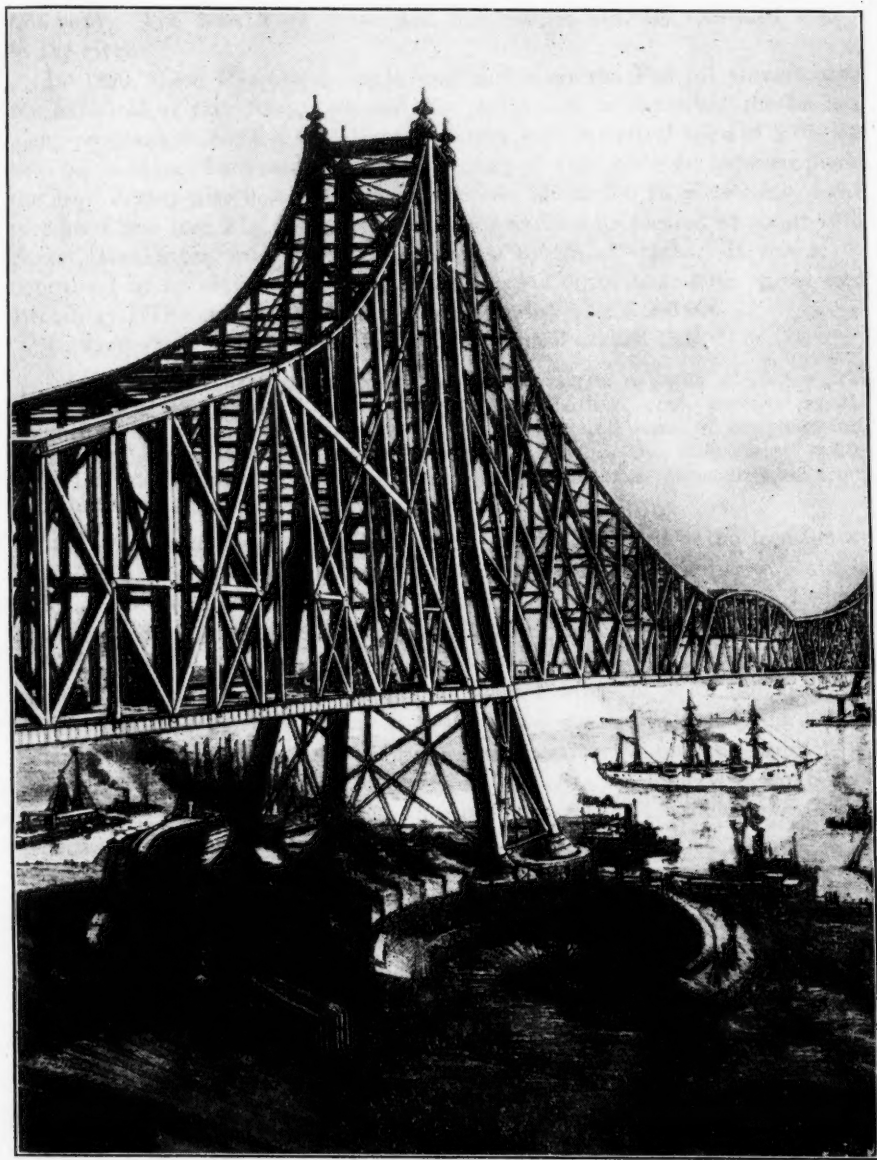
CANTILEVER BRIDGE NEAR 70TH STREET, MANHATTAN, PROPOSED IN 1893.
